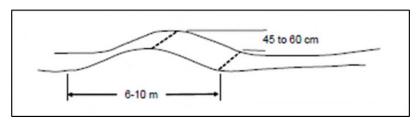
Cross-Section of Whoa-Boy in Access Track Pavement
